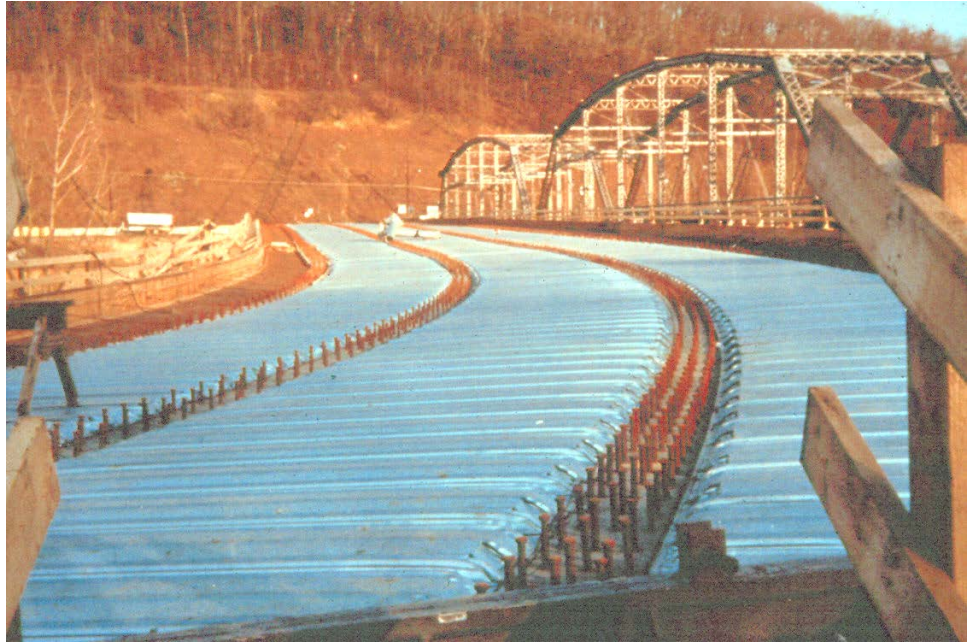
Shear Connectors Welded to the Top Flange of a Steel Girder for Composite Deck
